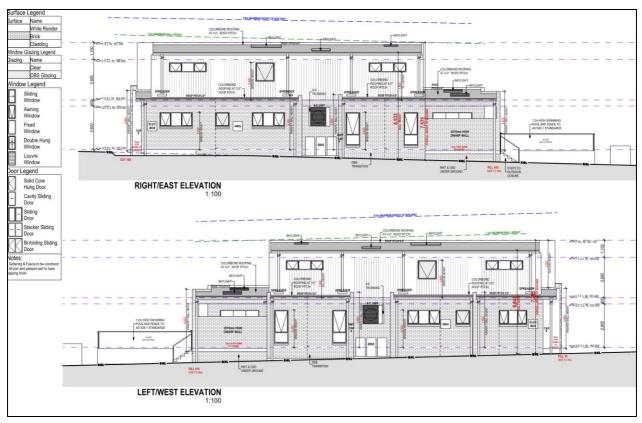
Proposed East and West Elevation Plan (Source: VD&D, 2025)
